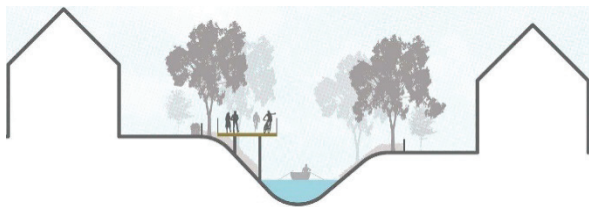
Widening of the culvert to create a nature walk and improve connectivity.
